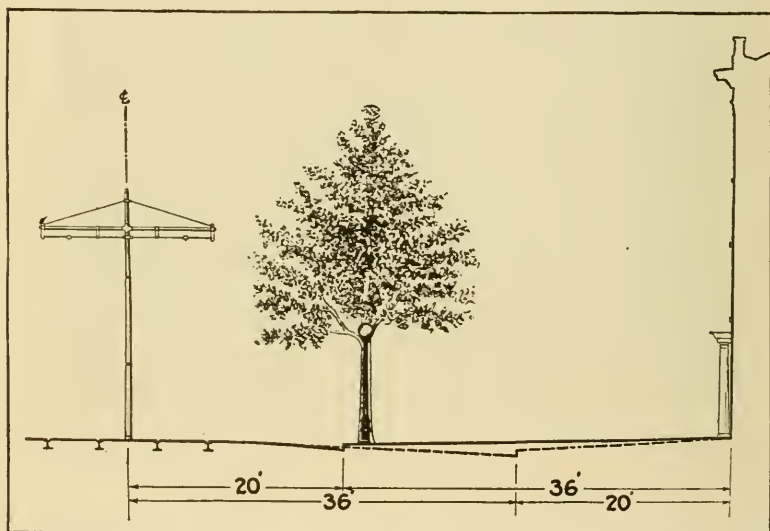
The widening of a 40-ft. center roadway on a 112-ft. rapid transit street requires changes in the existing roadway pavement and in the water and lighting systems. The sidewalk needs entire replacement and the trees are destroyed.
